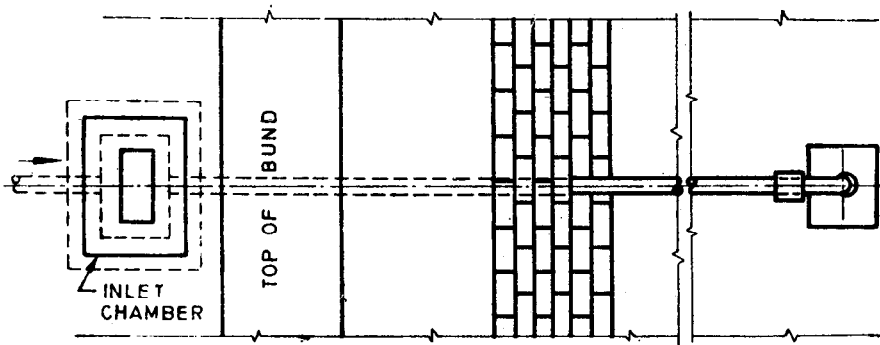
TYPICAL DETAILS OF INLET ARRANGEMENT WITHOUT SCREEN AND MEASURING ARRANGEMENT
